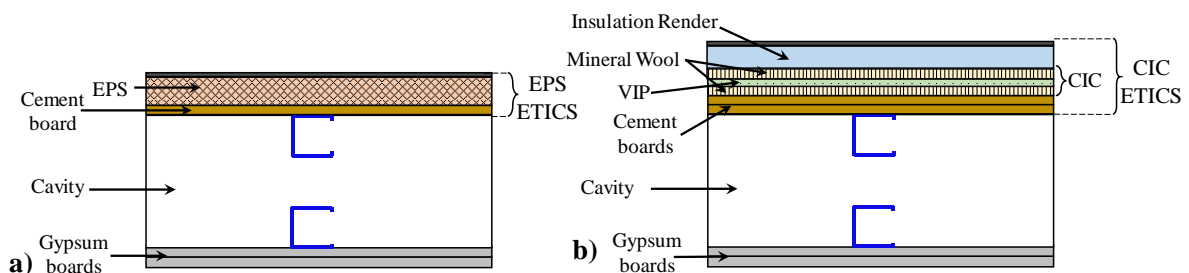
The configuration of the two types of walls: a) EPS wall and b) VIP wall.
